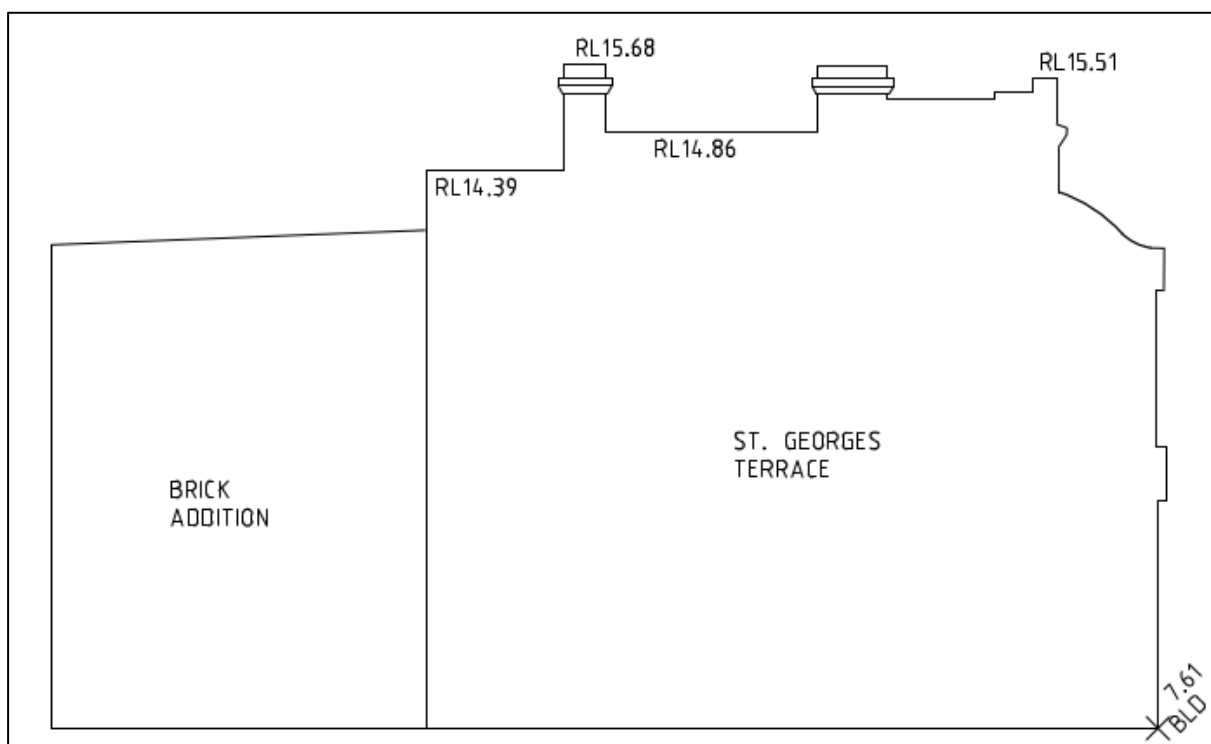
West elevation of St George's Terrace showing the intrusive brick rear addition (Source: LTS Lockley, 2020).
